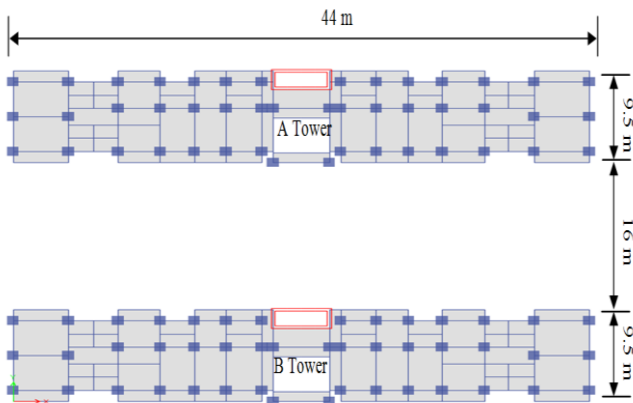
Typical Floor Plan of Twin-Tower Model In ETABs
